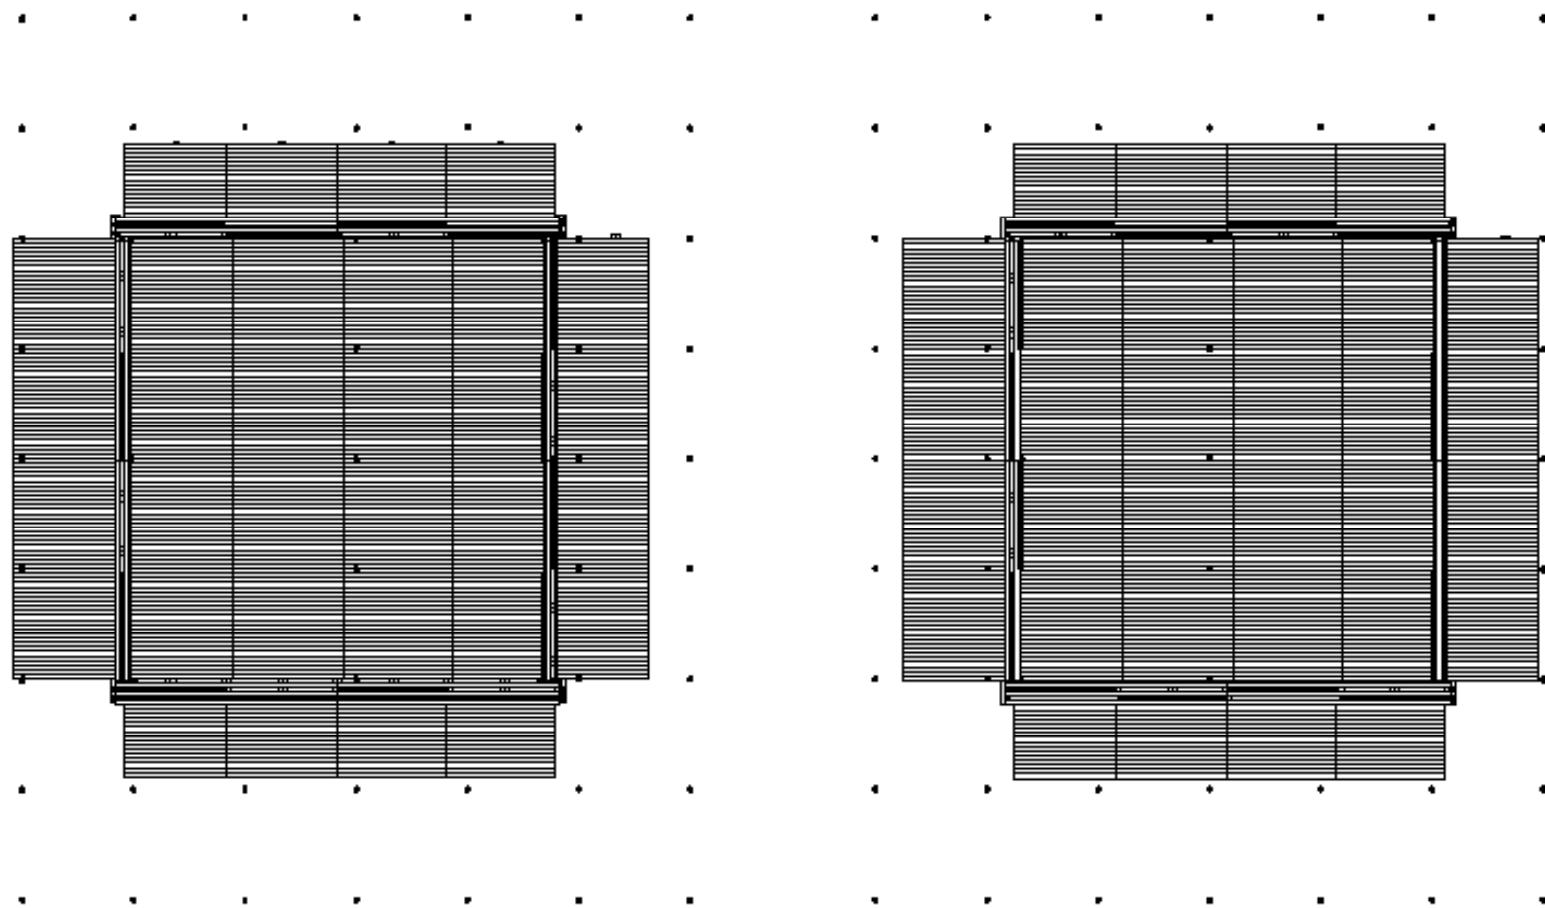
Community Centre Floor Plan (Not to scale).
